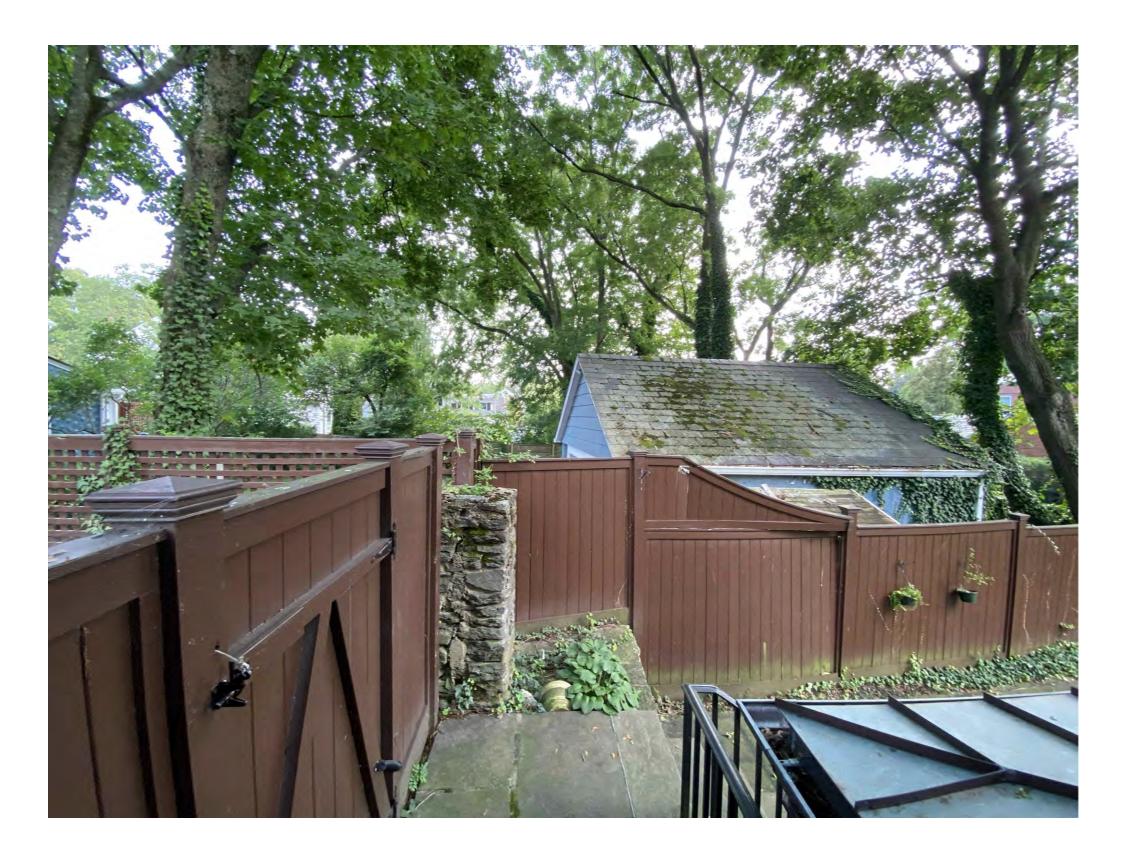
## PHOTO AT SOUTH EAST CORNER OF EXIST. HOUSE
